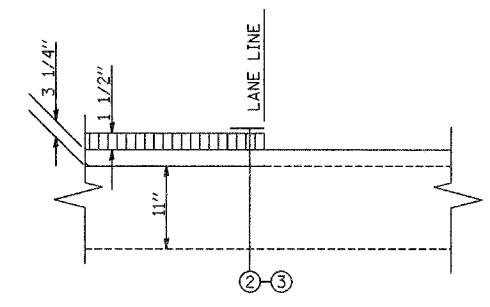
DETAIL E (EXISTING CONCRETE PAVEMENT AREA)
